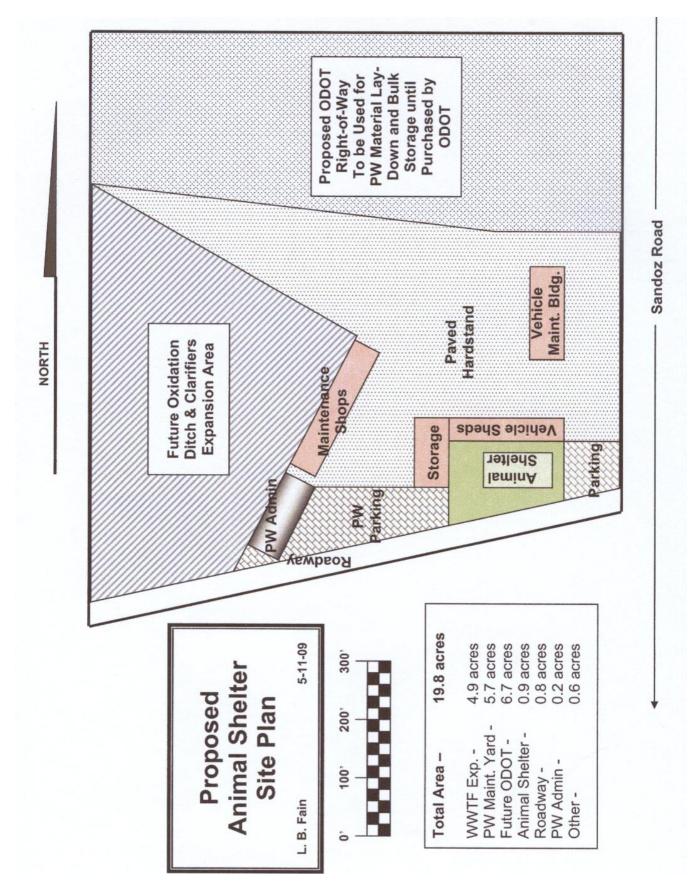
EXHIBIT F: CONCEPT DEVELOPMENT PLAN
